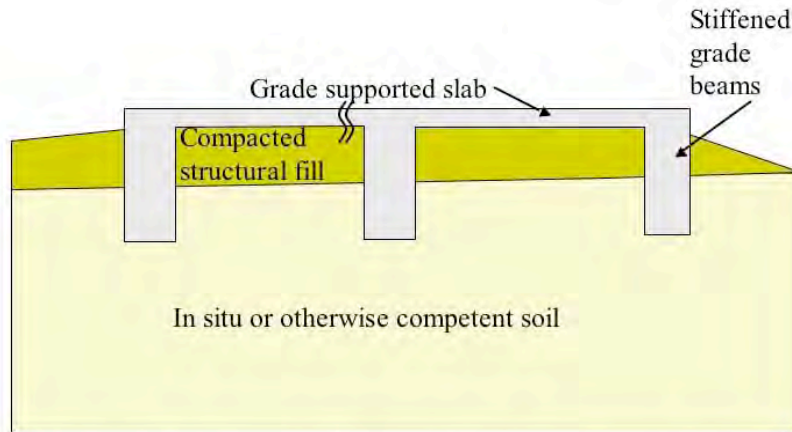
Grade-Supported Stiffened Non-Structural Slab
